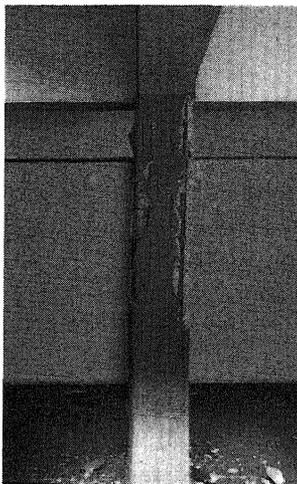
SHEAR FAILURES IN SCHOOL BUILDING'S COLUMNS
